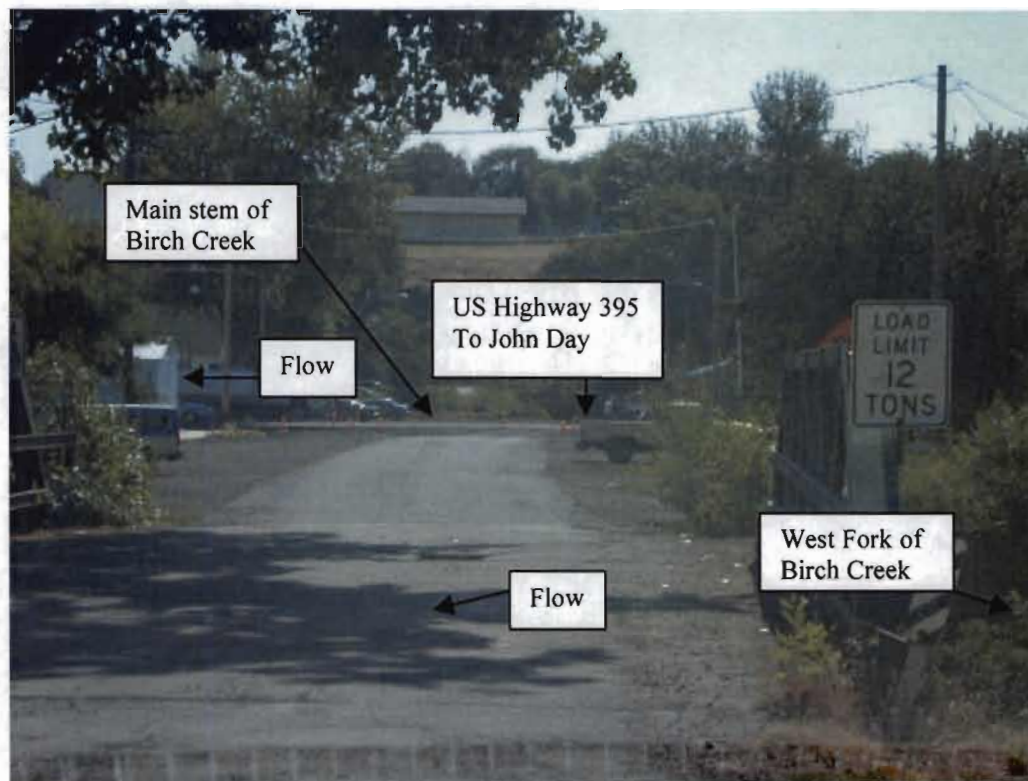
View looks east at bridge over West Fork of Birch Creek from 2nd St. and Delwood Ave.
